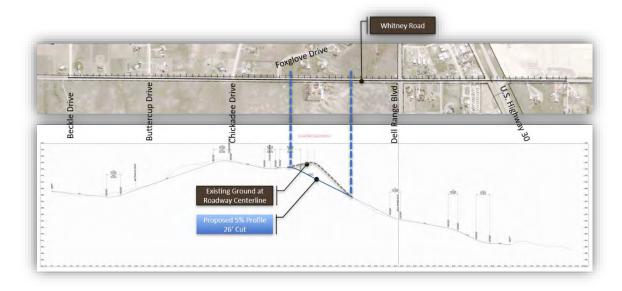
Existing and Proposed Profile Concept Whitney Road
